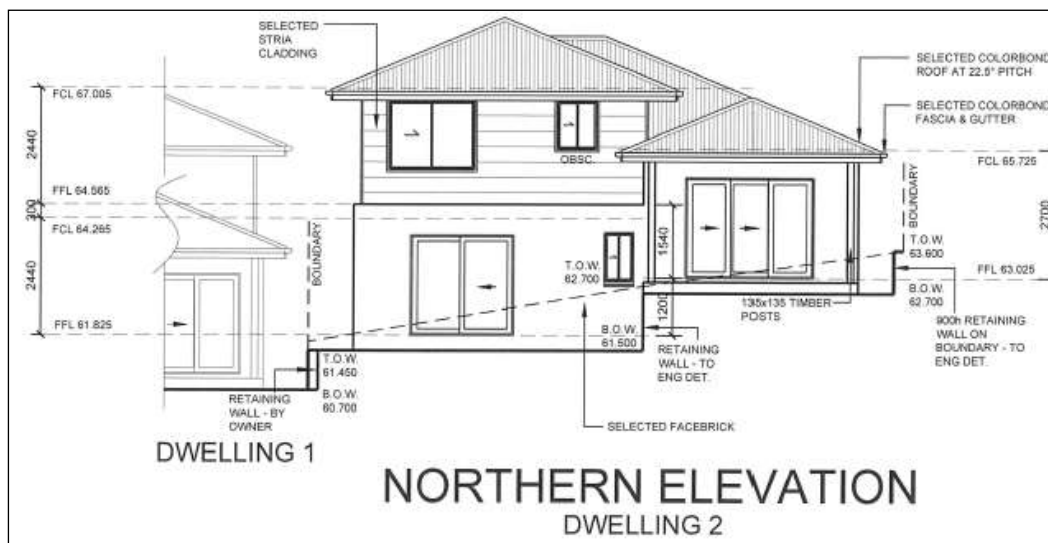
Northern Elevation Dwelling 2 (rear view)
